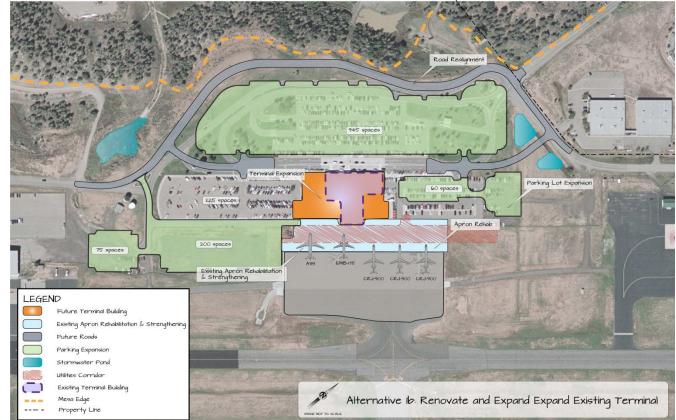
ALTERNATIVE 1B: RENOVATE AND EXPAND EXISTING TERMINAL
